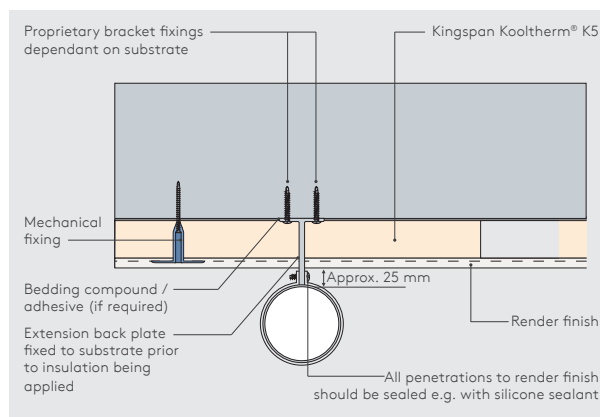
Drainpipe extension detail (applicable to a variety of external building ancillaries)
